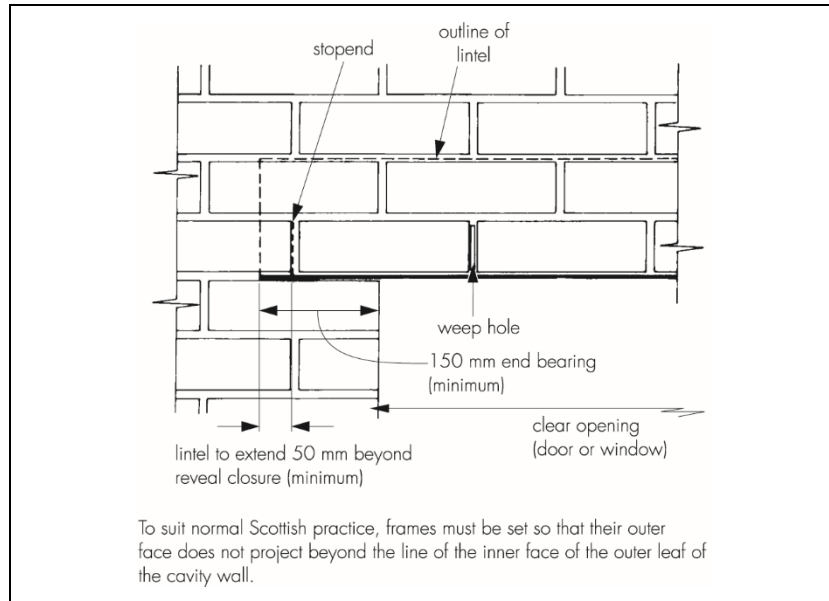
Detail showing minimum end bearing, stop-ends and weep holes
